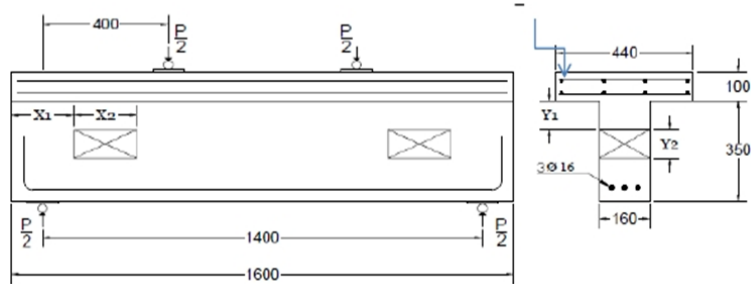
Dimensions and detailing of specimens of group B (Al-Sahlawi, 2018)
